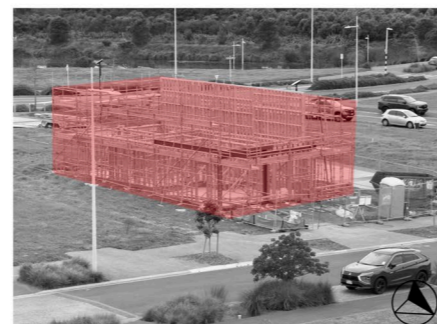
Photos taken on the project proposed site in Long Bay, Auckland. Analysing the site and surrounding spaces through zoning.
